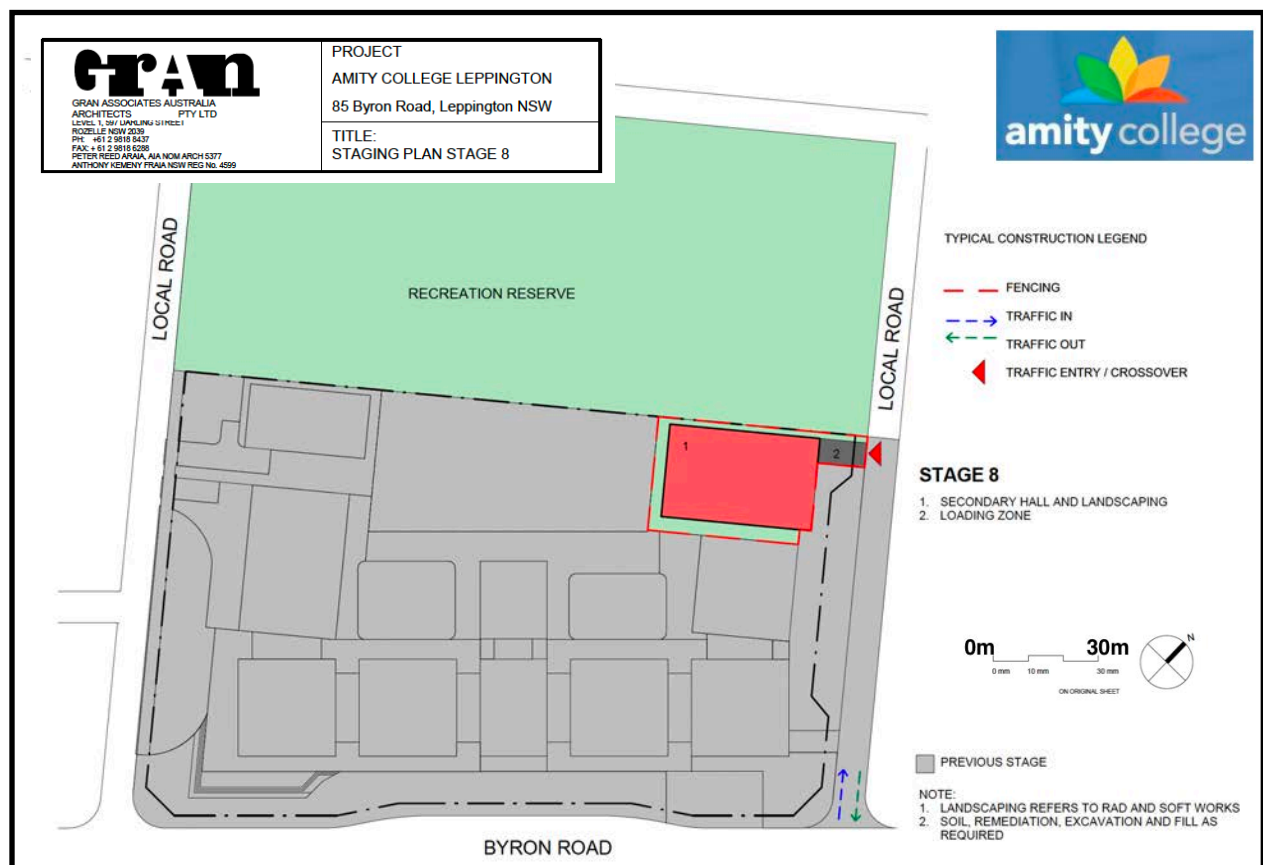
Proposed Stage 8 of Amity College school campus-secondary school hall
